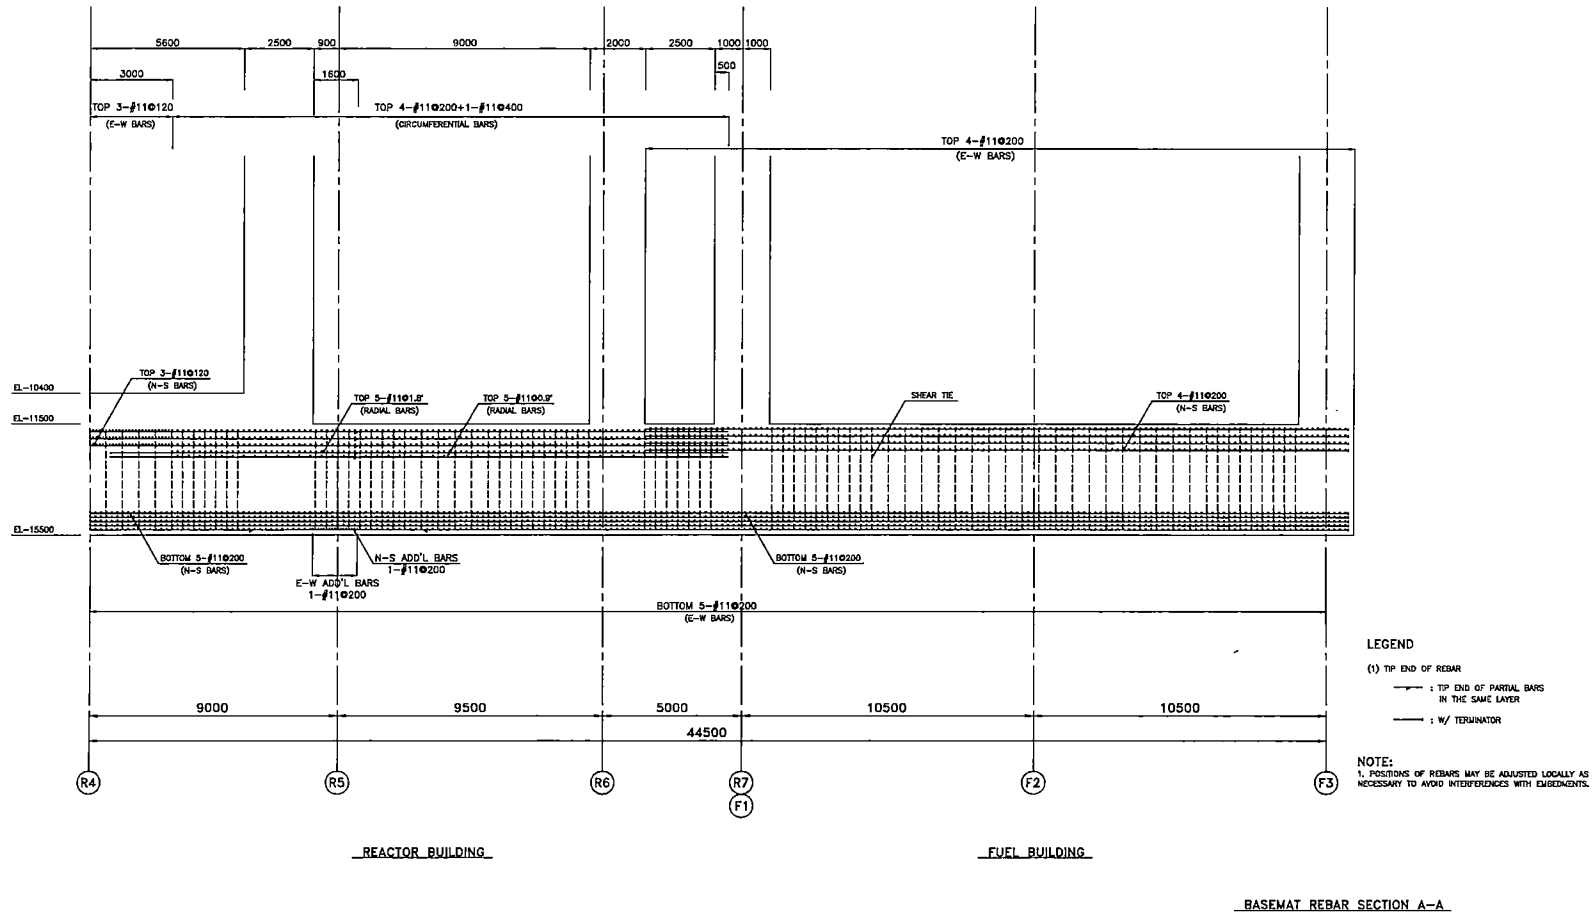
Reinforcing Steel of Foundation Mat: Section A-A
